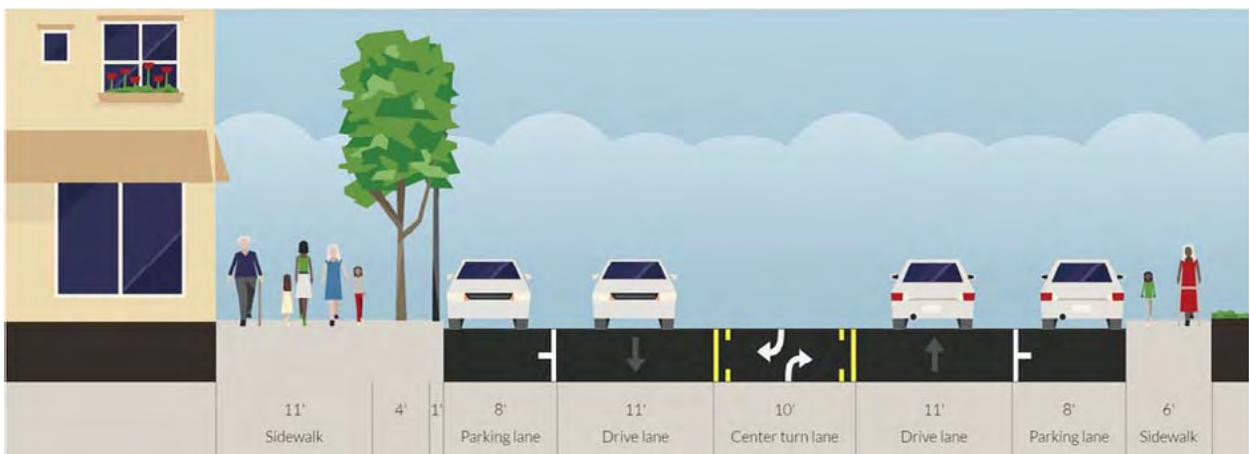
PROPOSED SECTION OF GREEN BAY ROAD (SPRUCE – ELM)
